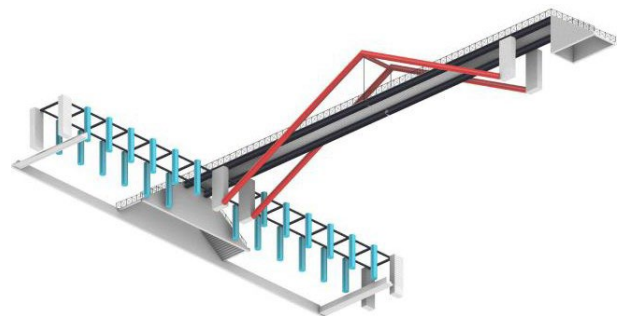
3D modelling reconstruction of the G. Polesello project for Accademia Bridge.
